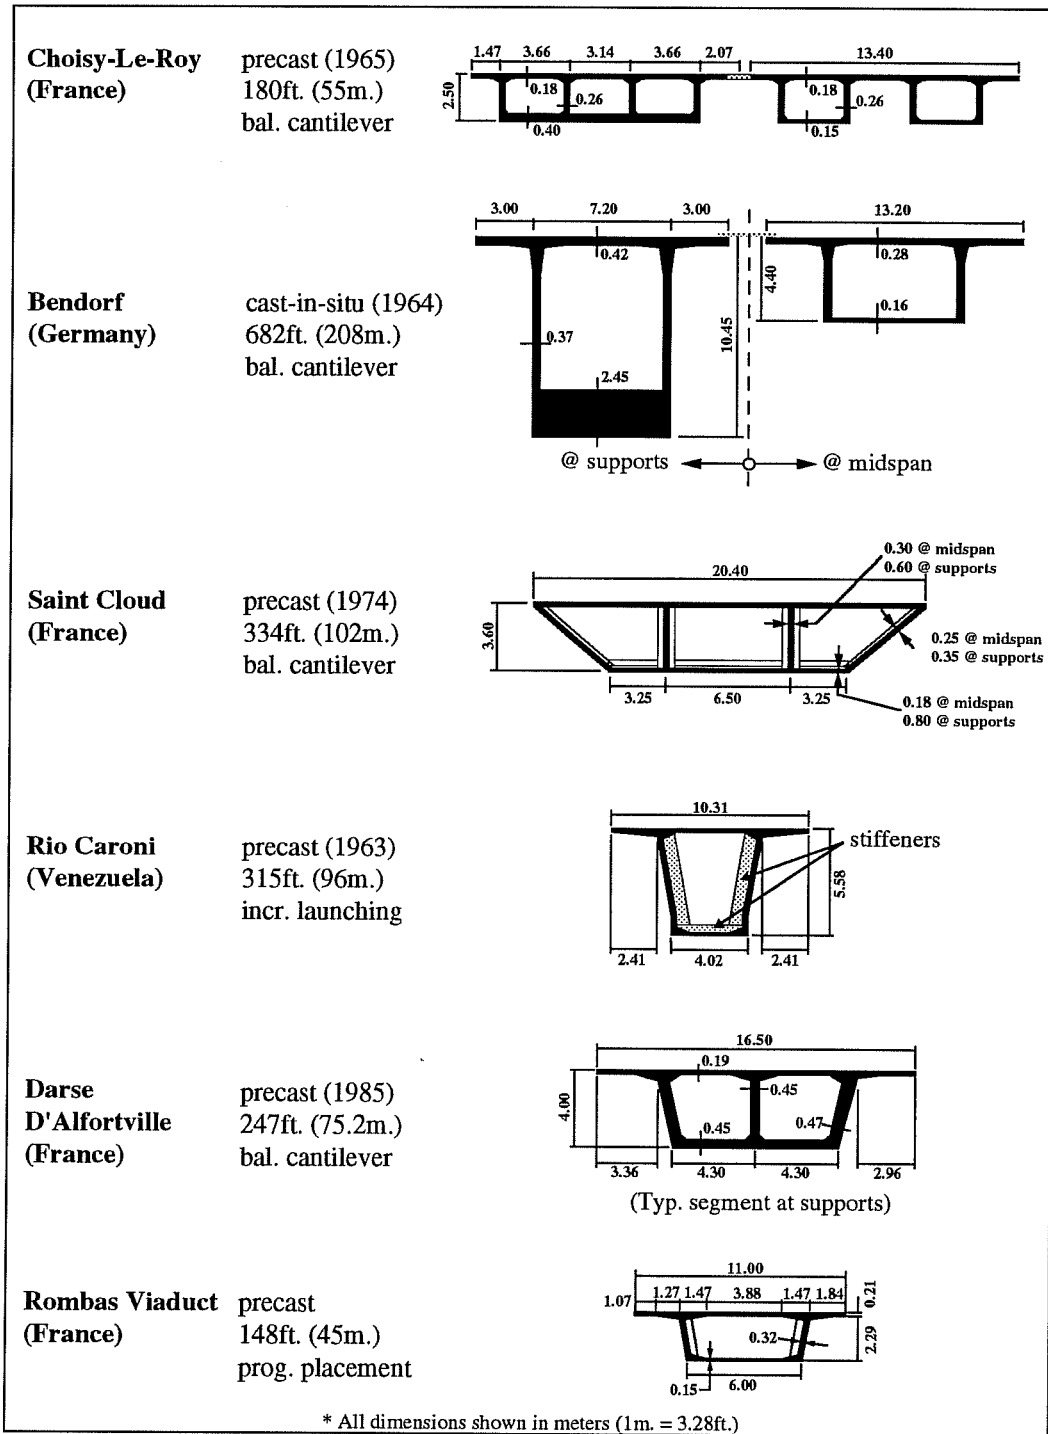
Cross-section geometry of typical concrete segments outside the US.
